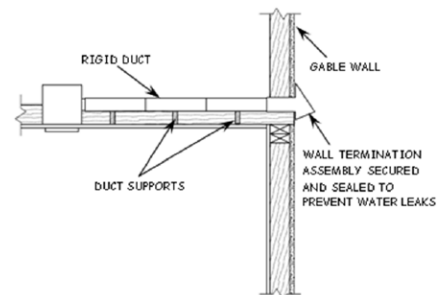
HORIZONTAL DUCT INSTALLATION AND TERMINATION
